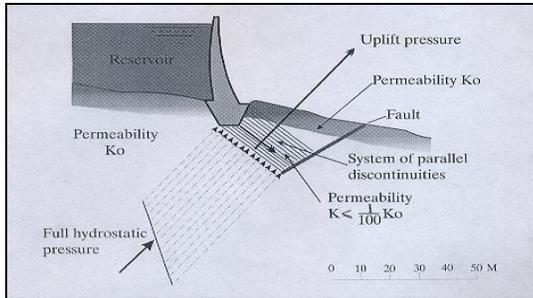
Three dimensional failure mechanism of Malpasset dam (Londe, 1987)
